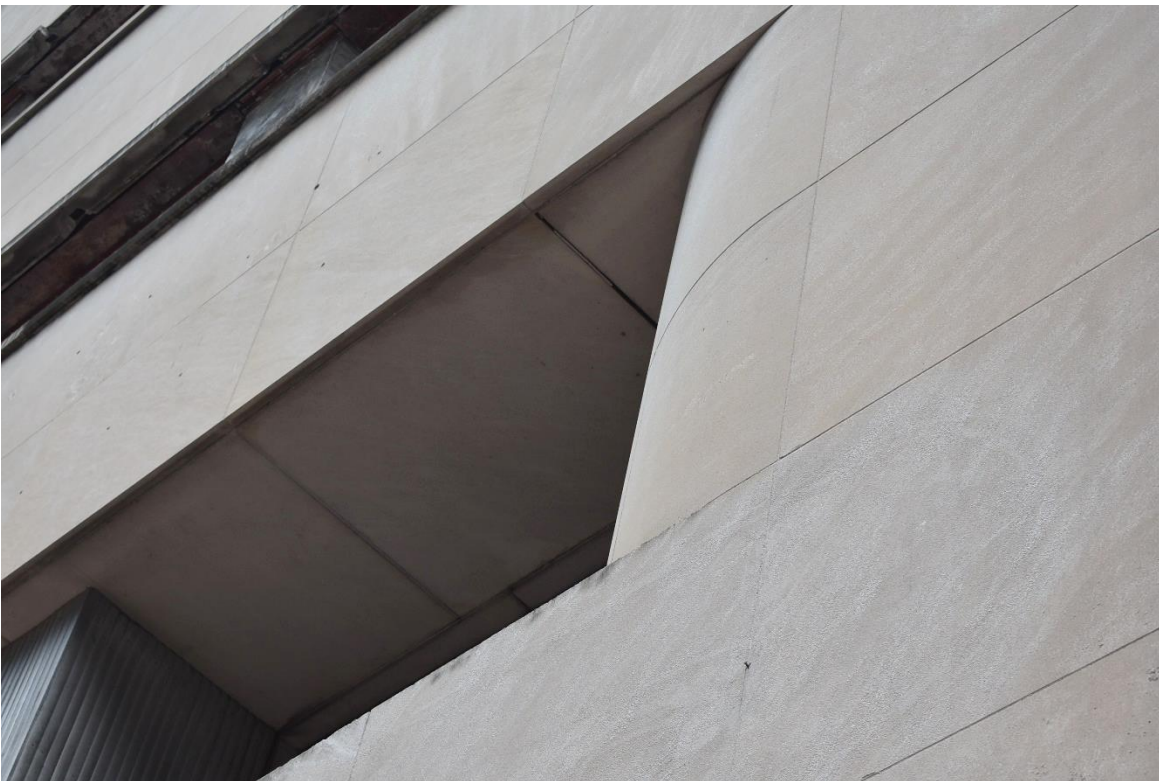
East elevation facing Main Street, second floor exterior details, view southwest.
